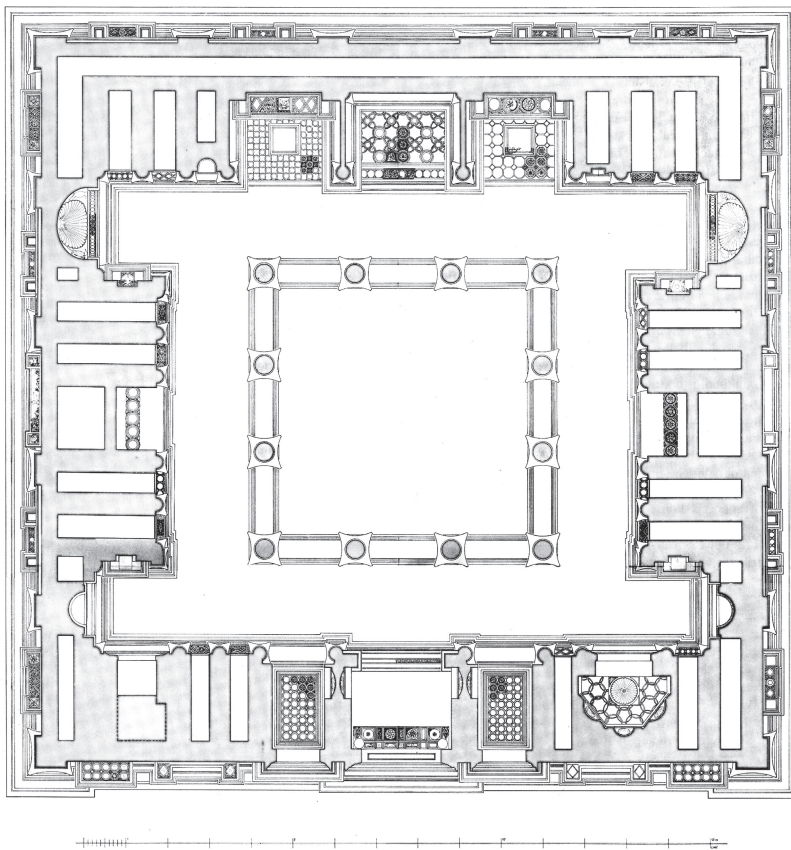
PALMYRA: TOMB NO. 36, RECONSTRUCTED GROUND PLAN.
